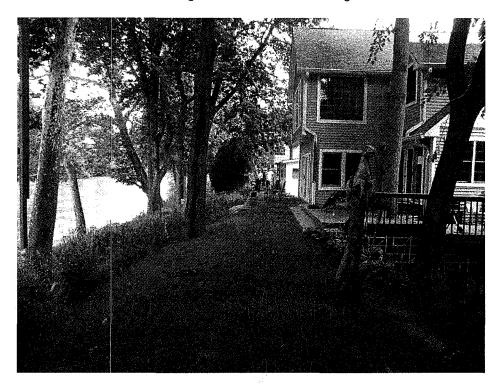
Riverward slope of levee and crest looking north (Station 28+00) Note the tree growth on the riverward slope and the houses encroaching onto the levee.
